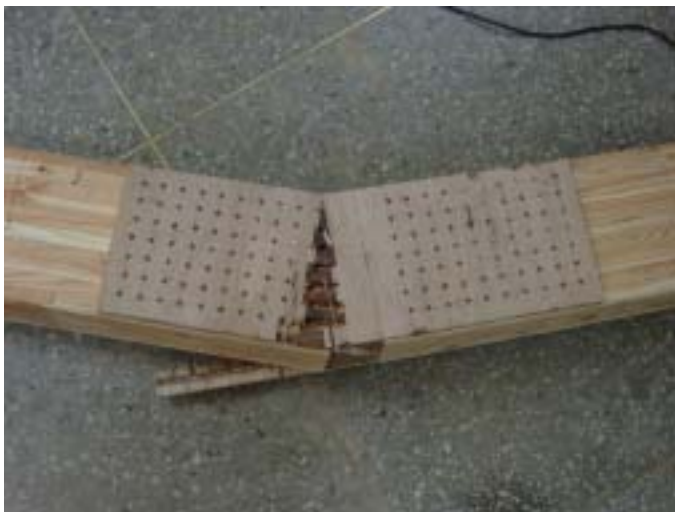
Failure of glulam beam with nailed-plywood gusset plate joint at center.
